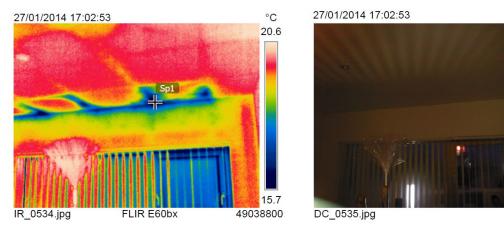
Repeating thermal bridge at intermediate floor level in a two-storey house.
